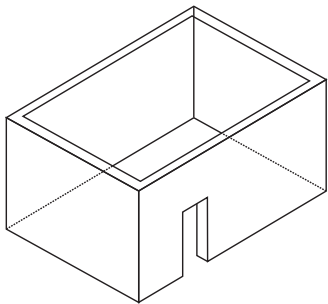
OUTDOOR AREA - EXAMPLE 1
